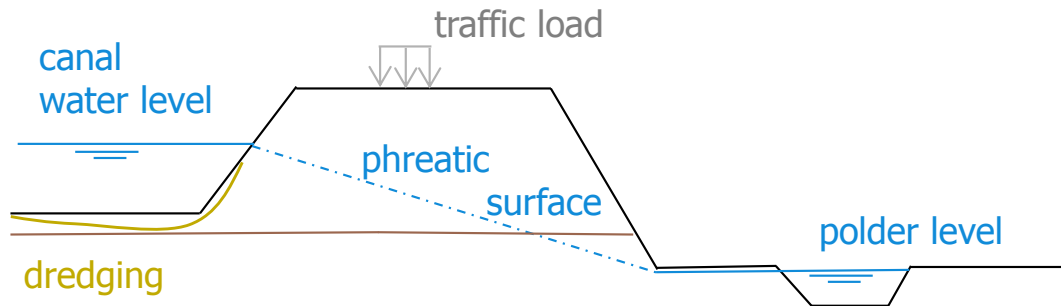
Cross section of a canal levee, illustrating the main loads acting on a canal levee
